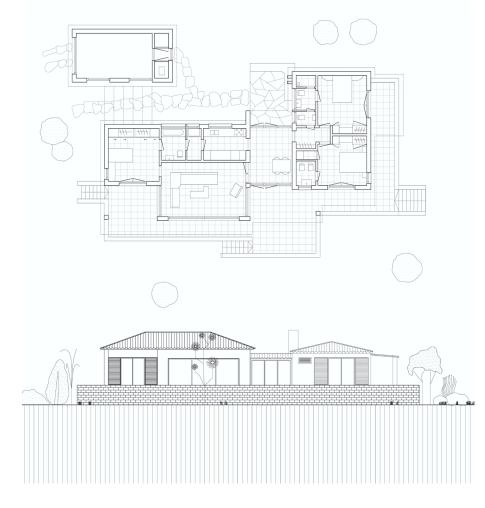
Holiday house in Altea, Spain, 1971, plan and façade. Source: drawing Giuliana Sabelli The interior design was a combination of white walls, wooden furniture and elements —curtains, sofa upholstery, rugs, lamps— in tones of dry green and ochre. As some archive images capture, Jansen also decorated the interior with plants and vases of flowers. Far from minimalist modernity, the space had a great warmth and a sense of the domestic anchored in the cultural traditions of the place. (Fig.11)
